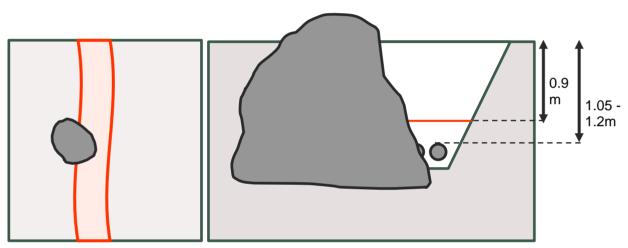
Overhead View and Cross section of an example of large rock which can be broken or removed (pre-removal).
